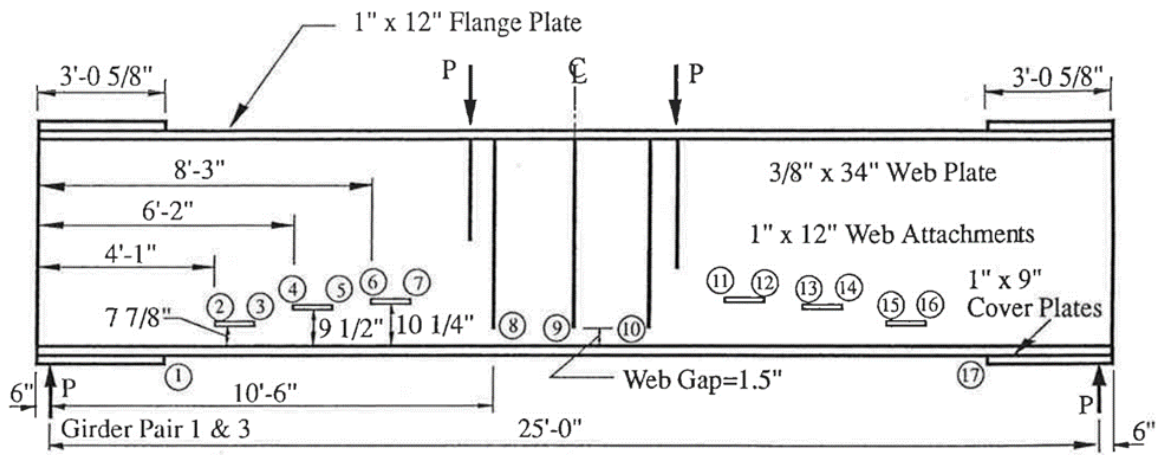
Multiple fatigue details on a plate girder.
